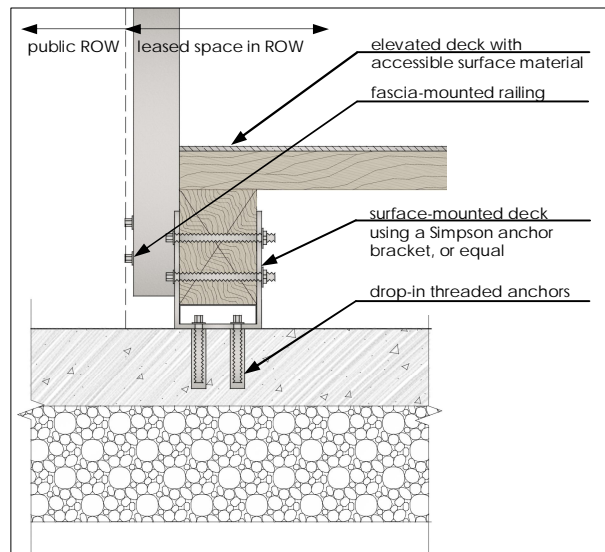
Fascia-mounted Railing on Raised Deck
